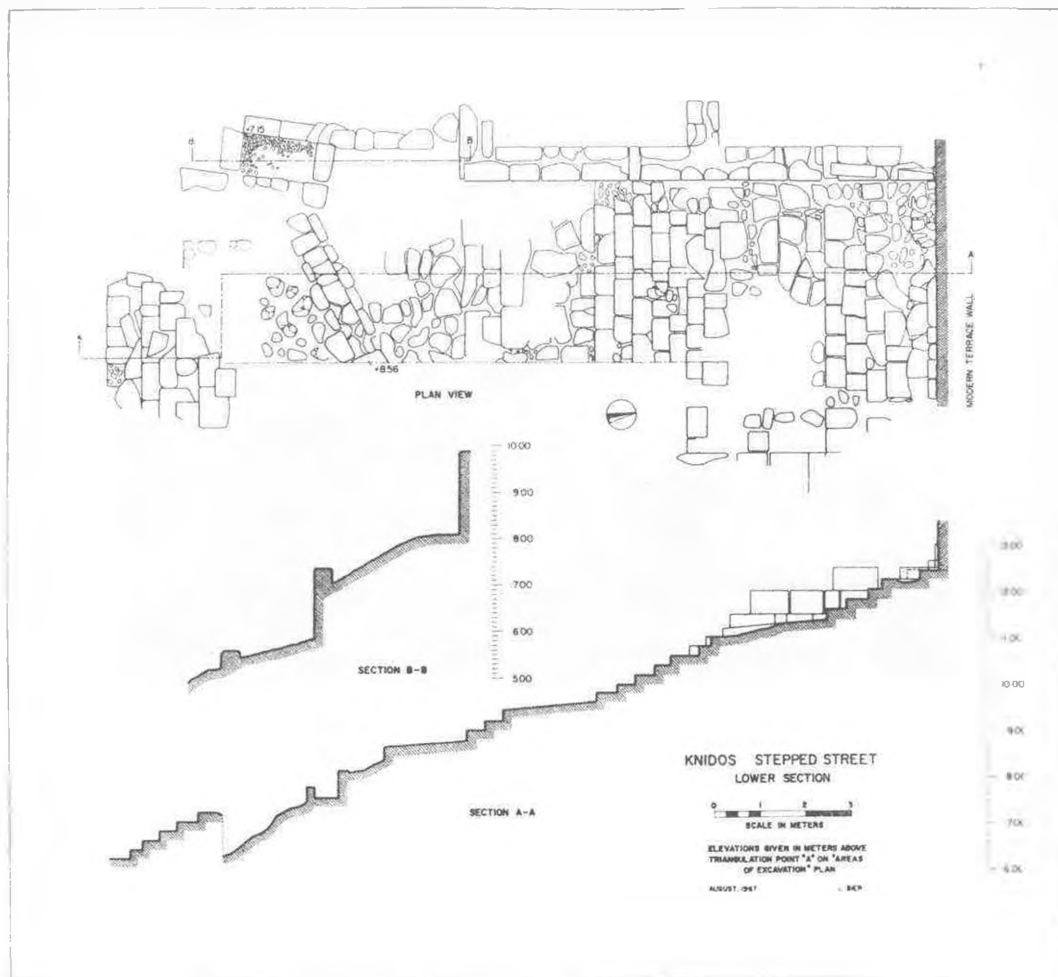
A Drawn plan and section - stepped eetstr - lower section.
